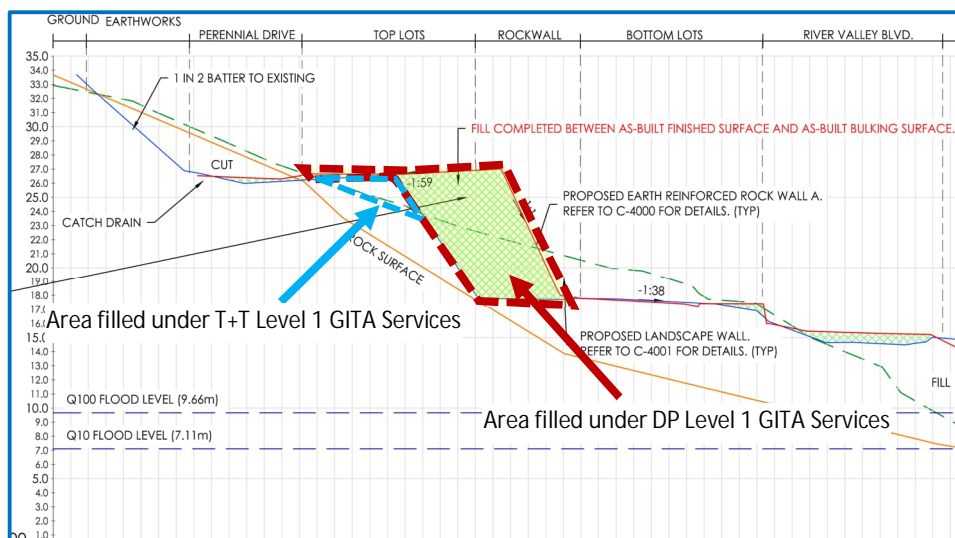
Extract from CJ Arms drawing sectional view of areas supervised by Chadwick Geotechnics and DP
